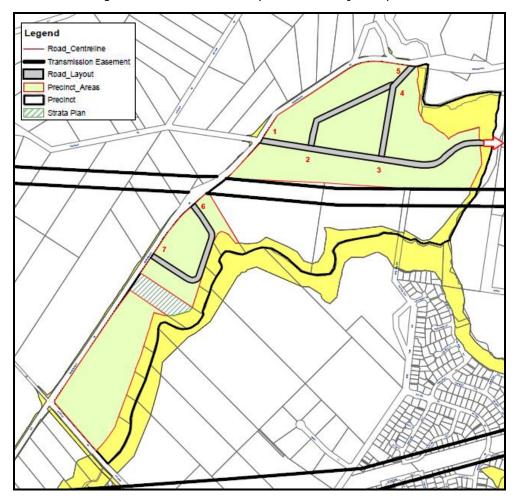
Master Plan – Proposed Road Layout Option 2
